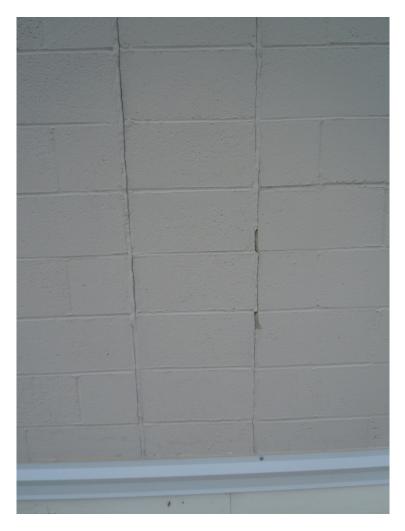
Expansion Joint at Each Side of Masonry Pier
